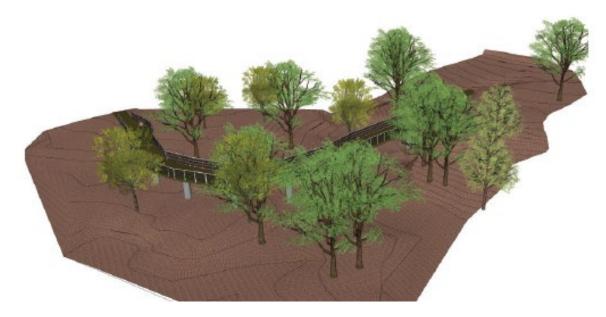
Proposed elevated boardwalk crossing over Steele Canyon Creek, looking east (upstream) with trees.
